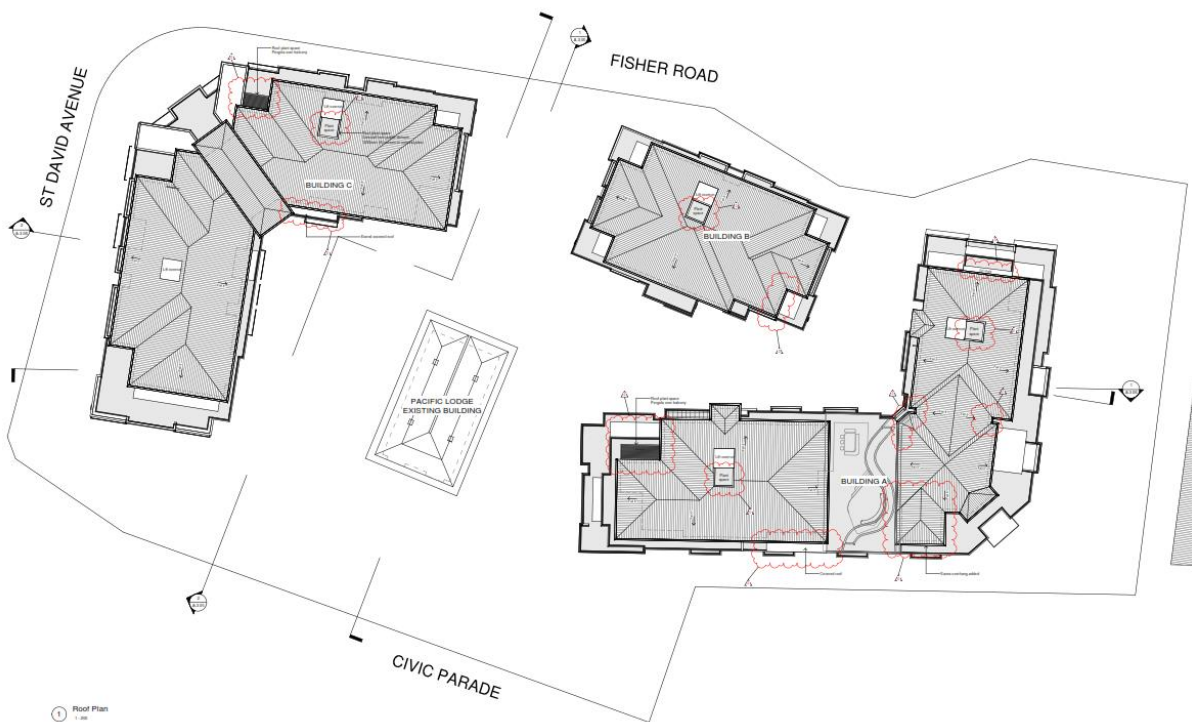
Pacific Lodge & Roof Plan (Dwg No. A 2.08)
